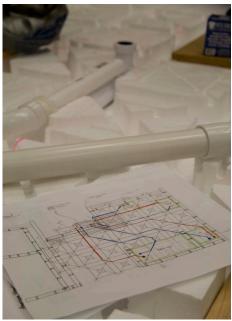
An empty SHELL (Base Building) space is shown with a service point from which MEP systems are connected to their respective equipment in any floor plan layout. The SHELL can be a MODULAR UNIT. Figure 9 also shows the disentangled subsystems of the INFILL (Fit-Out) System.
